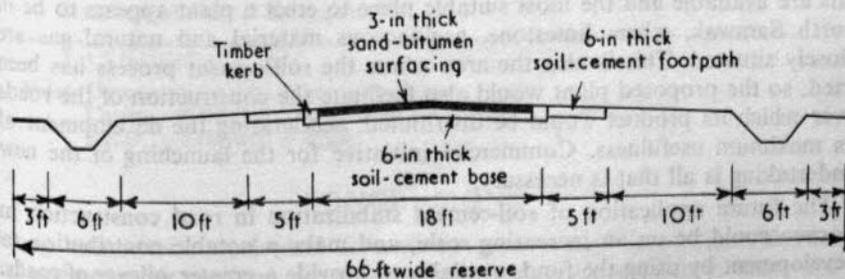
Section of stabilized soil residential road, Krokop, Sarawak
